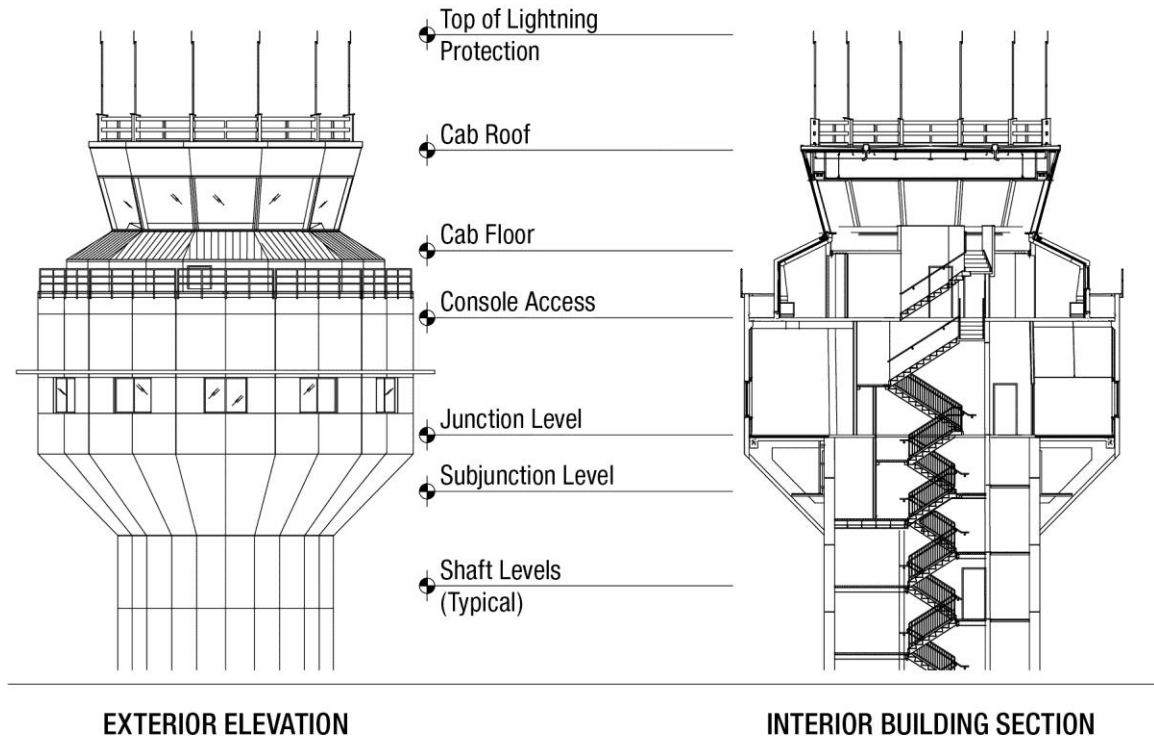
Airport Traffic Control Tower – Typical Floor Levels
